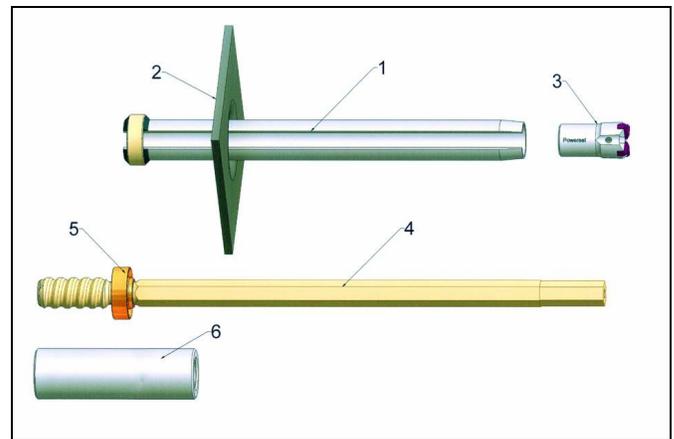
Components of the Power Set rock bolt system (caption: 1 -Power Set bolt; 2 - anchor plate; 3 - drill bit; 4 - drill rod; 5 - impact ring; 6 - adapter coupling).
